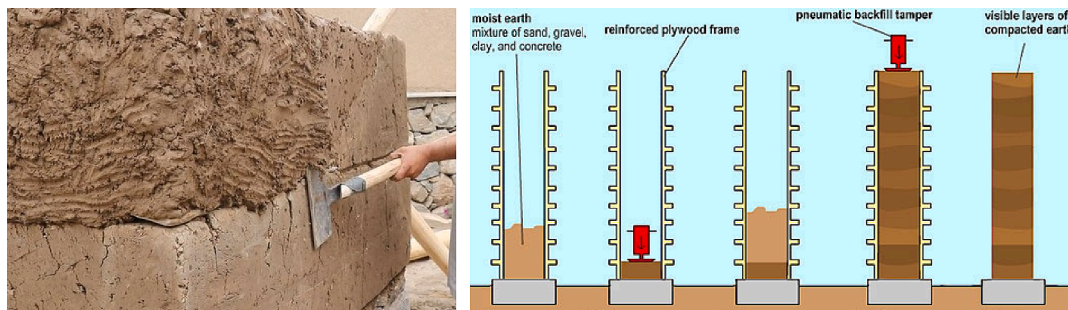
Adobe (left) [18] and rammed earth (right) material used for wall construction.
